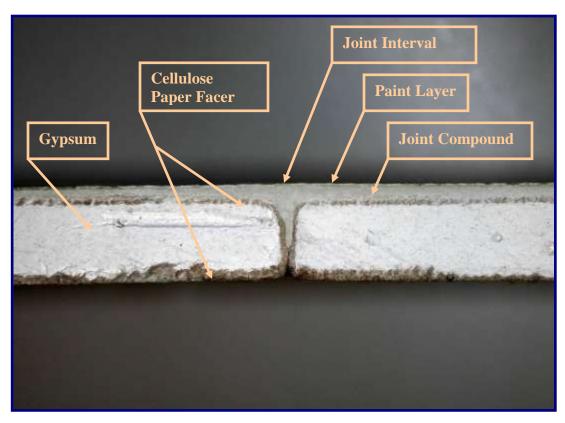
Section of ½-inch gypsum wallboard showing a multi-layered joint interval.
